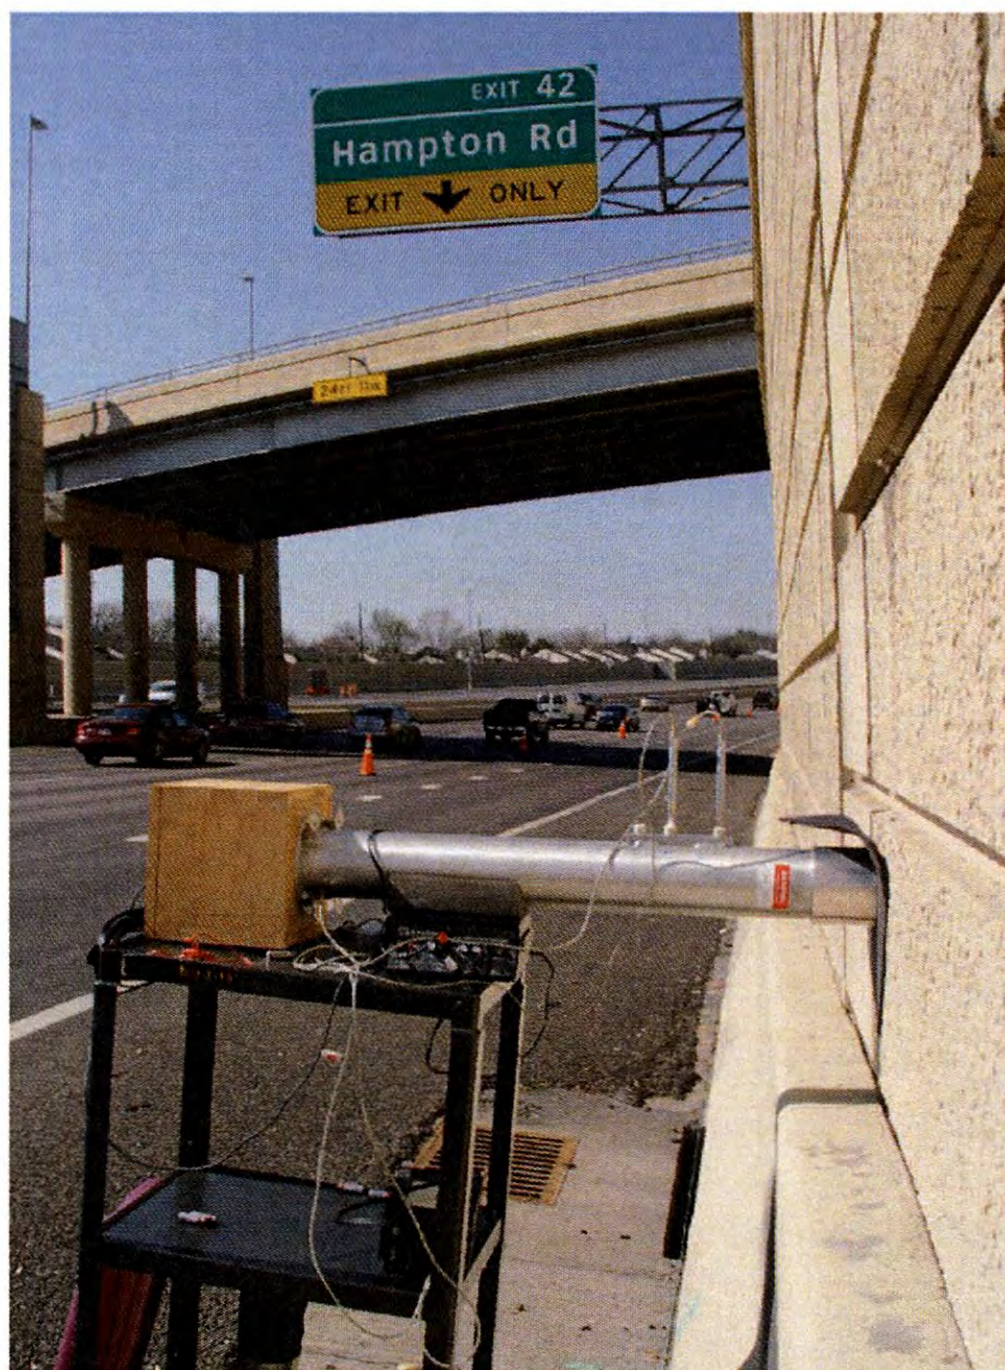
Impedance tube in situ testing of IH-30 retaining wall
